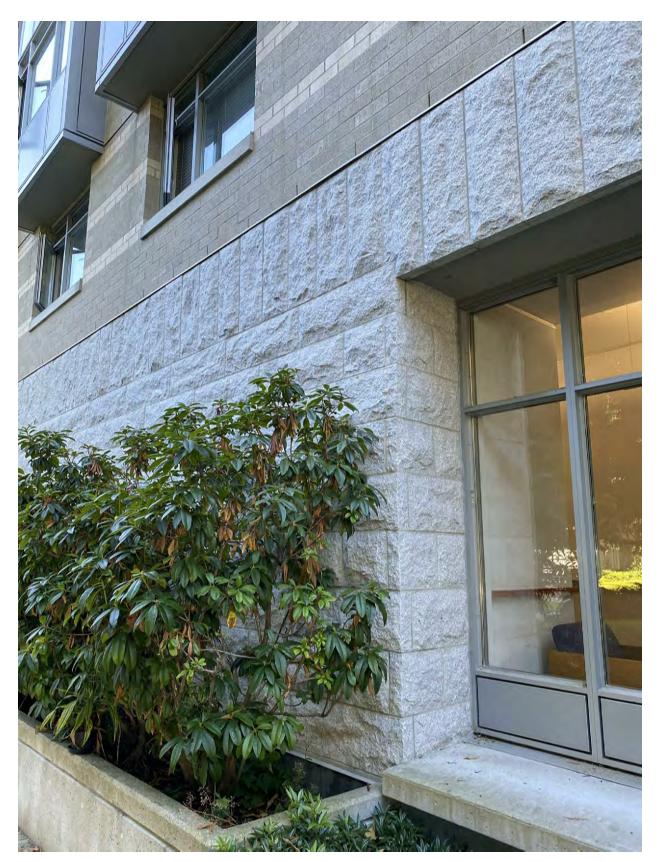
Carey Hall (Existing 2005 Building) - Details at Interior Courtyard
